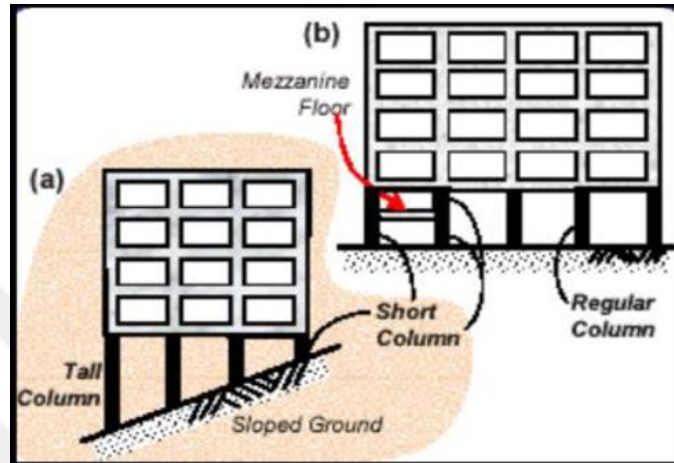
Examples of common building types with short columns (Murty, 2005)
